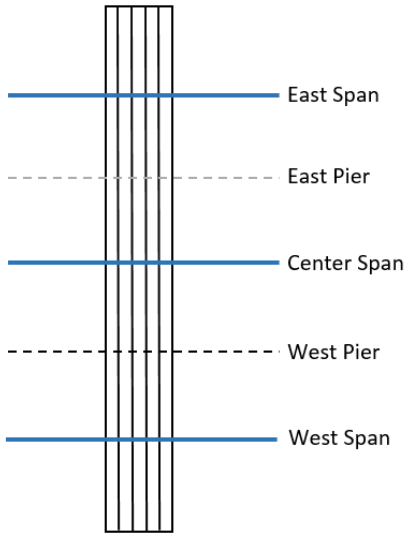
Maple Bridge instrumented braced deck pour cross-sectional locations
